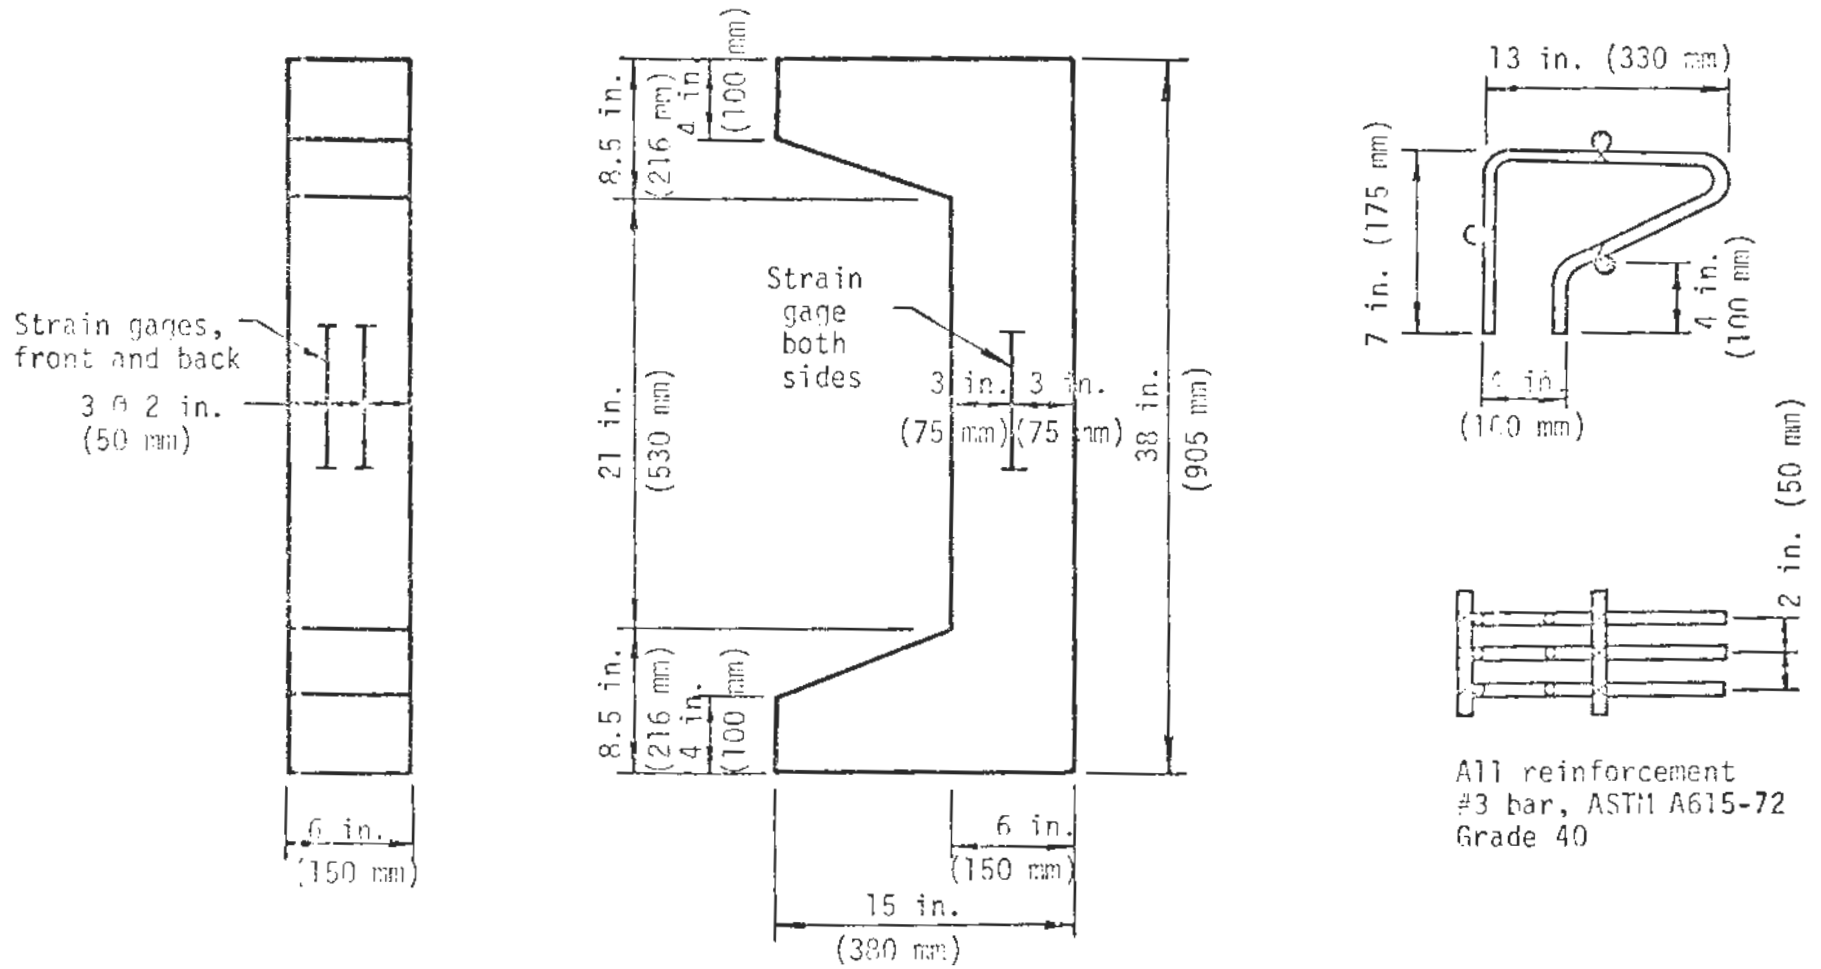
DETAILS OF BEAM-COLUMN AND CAPITAL REINFORCEMENT
